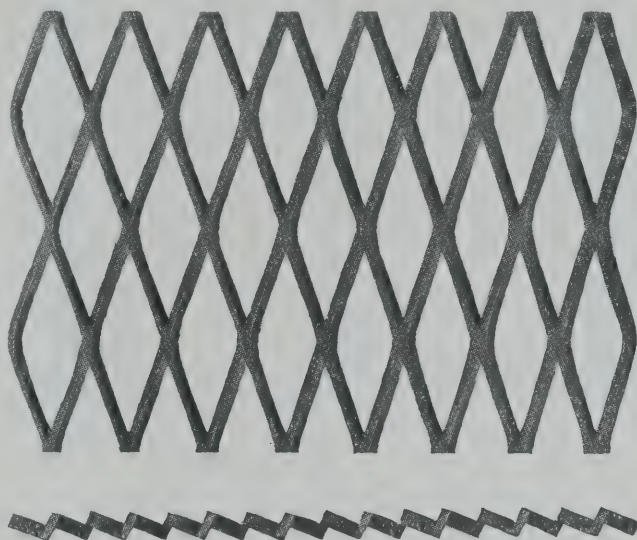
WIRE LATTICE IN WALL FOUNDATION.
